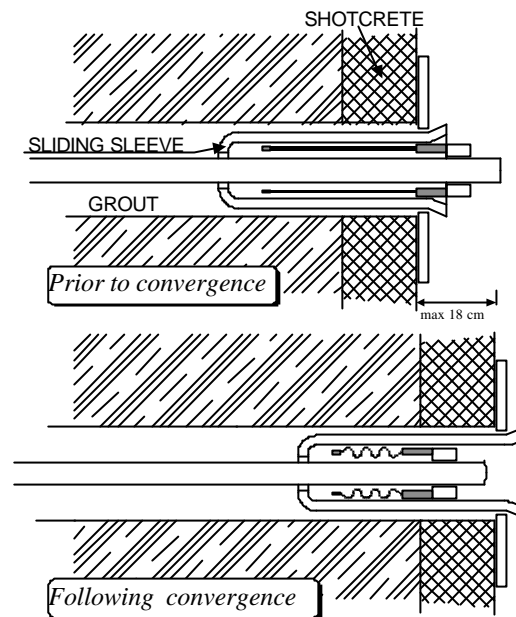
Typical yielding bolt as developed in connection with the excavation of the Karawanken Tunnel in squeezing rock conditions (redrawn from Schubert W. and Schubert P., 1993)
